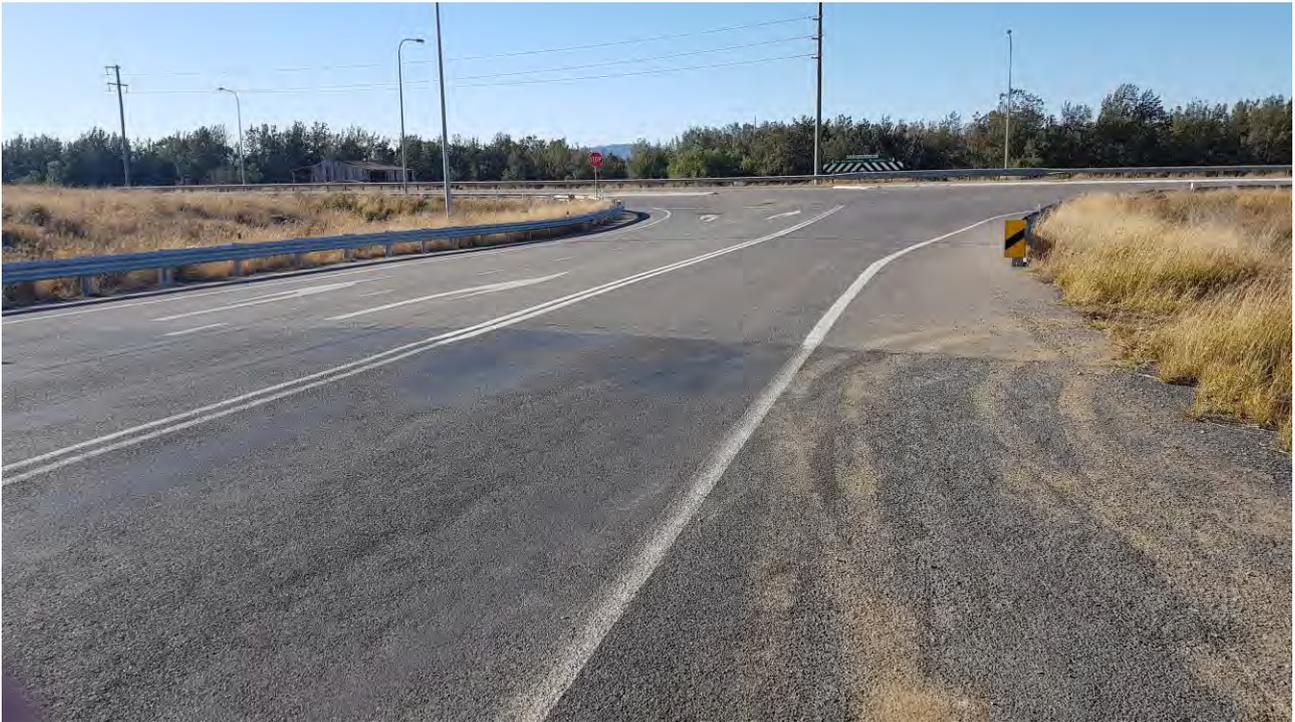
Looking North-East, joining of 2 pavements, road uneven small depressions
